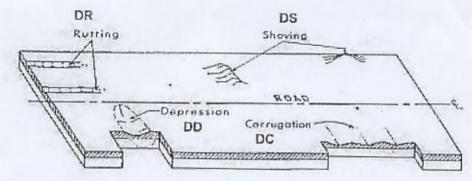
DEFORMATION DEFECTS IN FLEXIBLE PAVEMENTS
